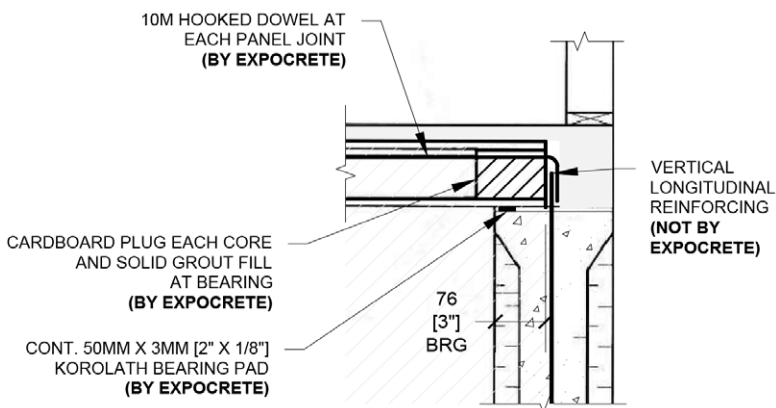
Masonry / ICF Foundation (Scale - N.T.S.)
